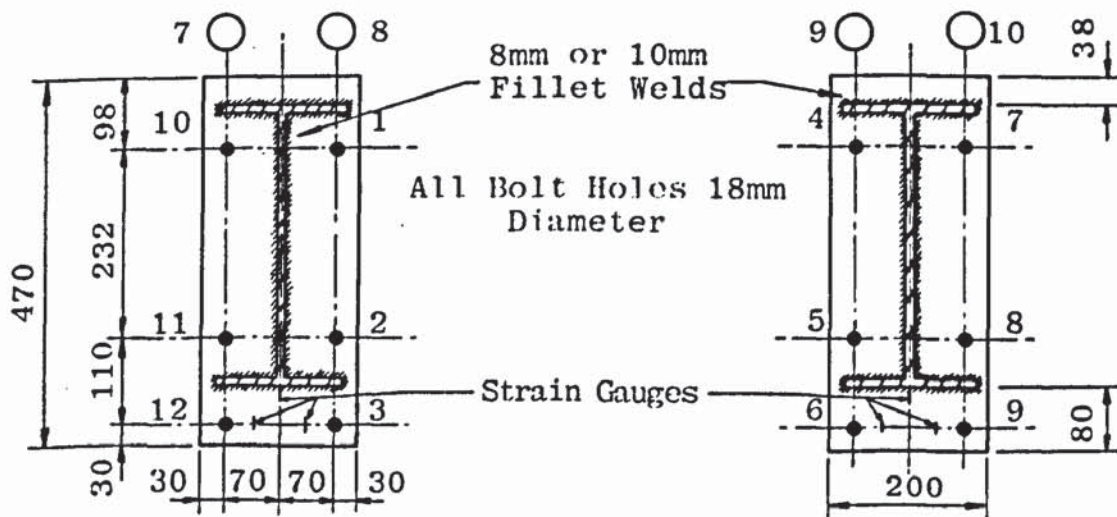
TEST RIG FOR BEAM TO COLUMN CONNECTIONS
